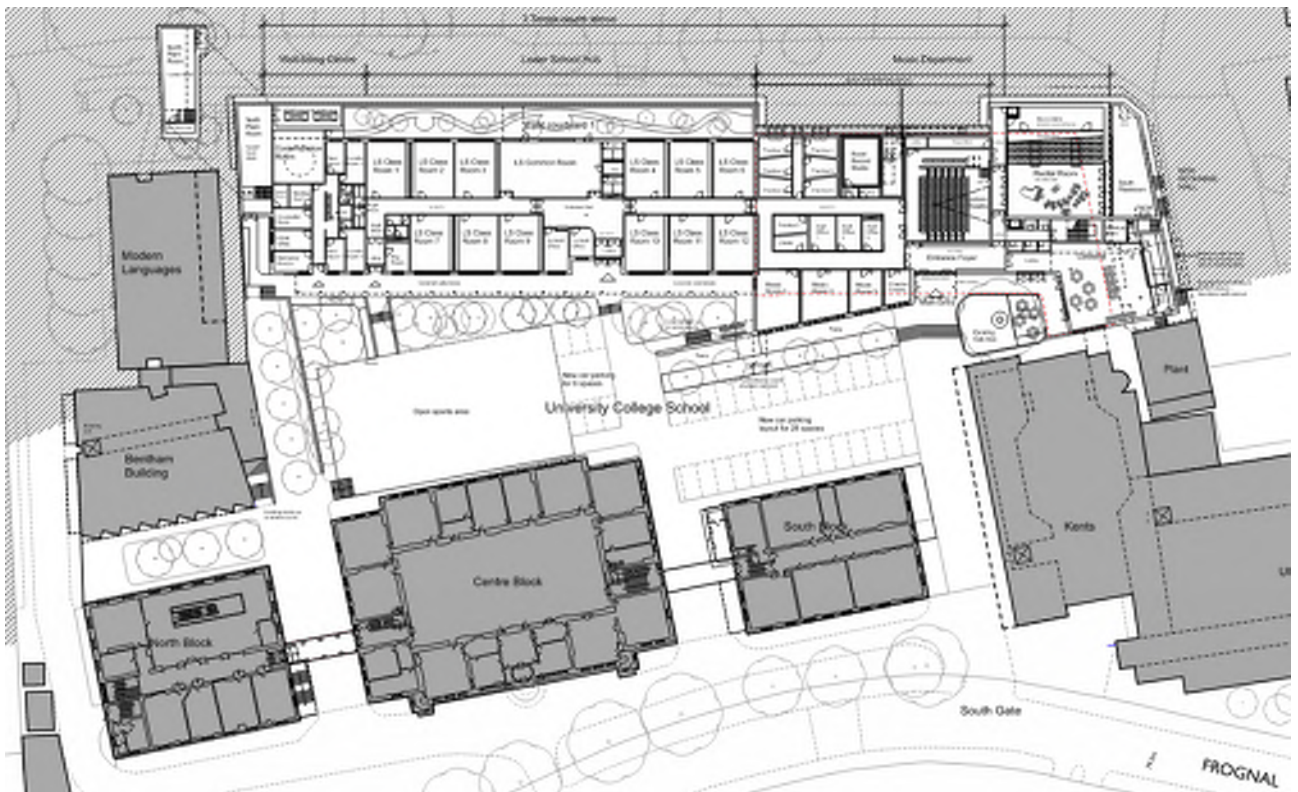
Extract from Ed Toovey Architect's Proposed Ground Floor Plan (Drg. No. 2037/GL/011).
